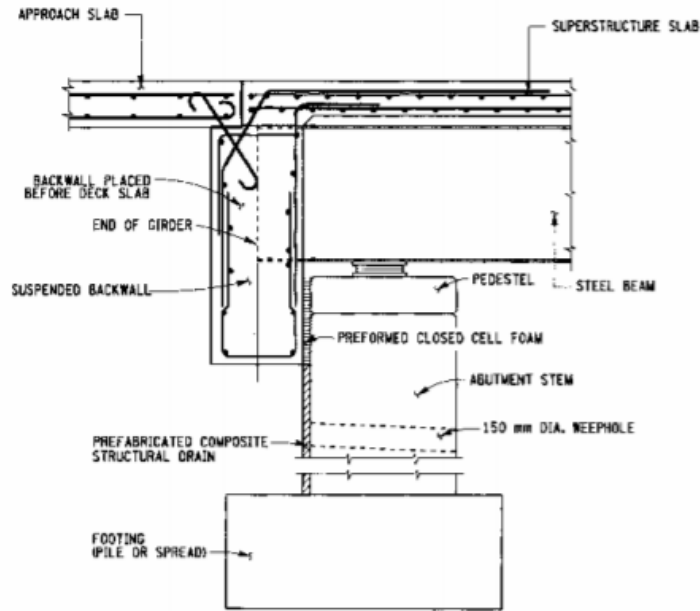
Semi-integral abutment bridge detail.* Source: Hoppe et al, 2016.
